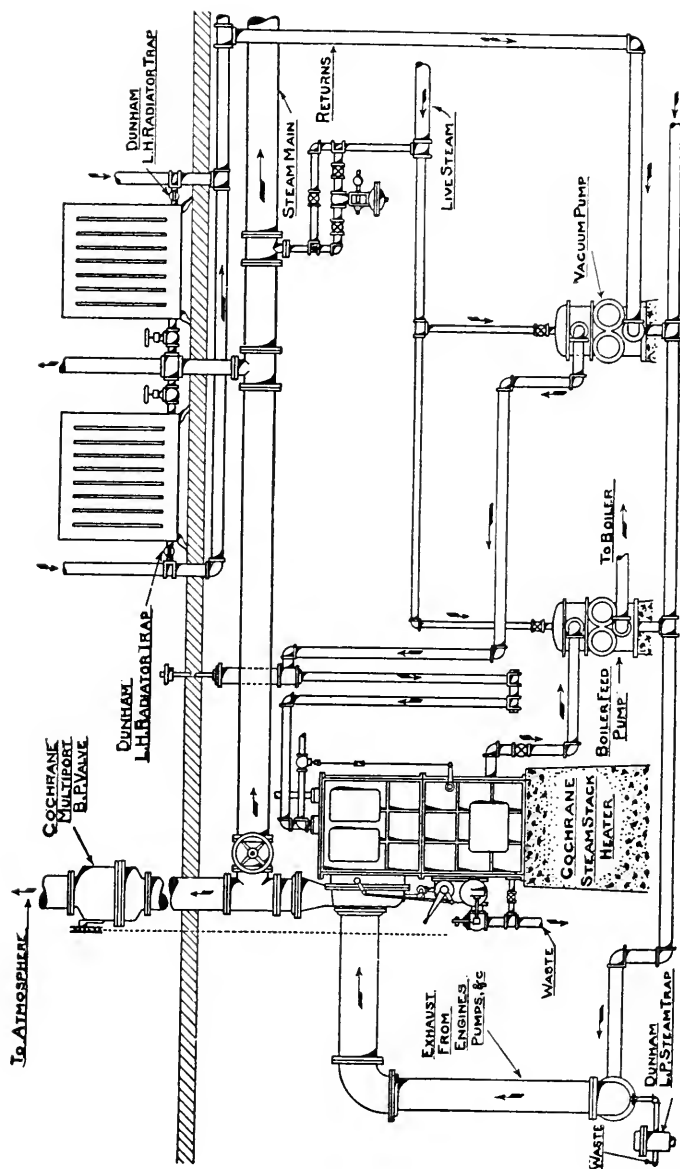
VACUUM SYSTEM AS APPLIED TO EXHAUST STEAM HEATING.
